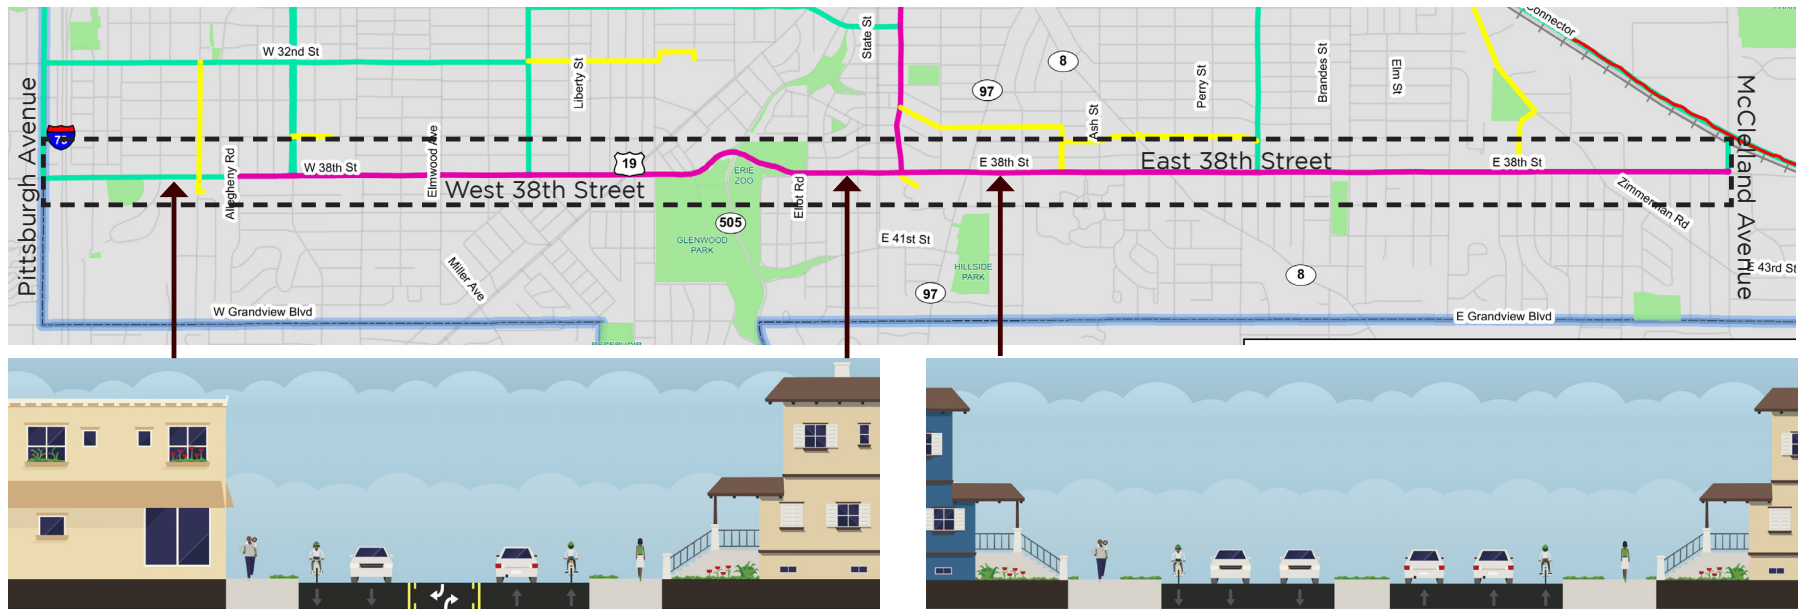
Potential recommendation for West 38th Street, Pittsburgh Avenue to Averlon Avenue and Eliot Road to State Street
